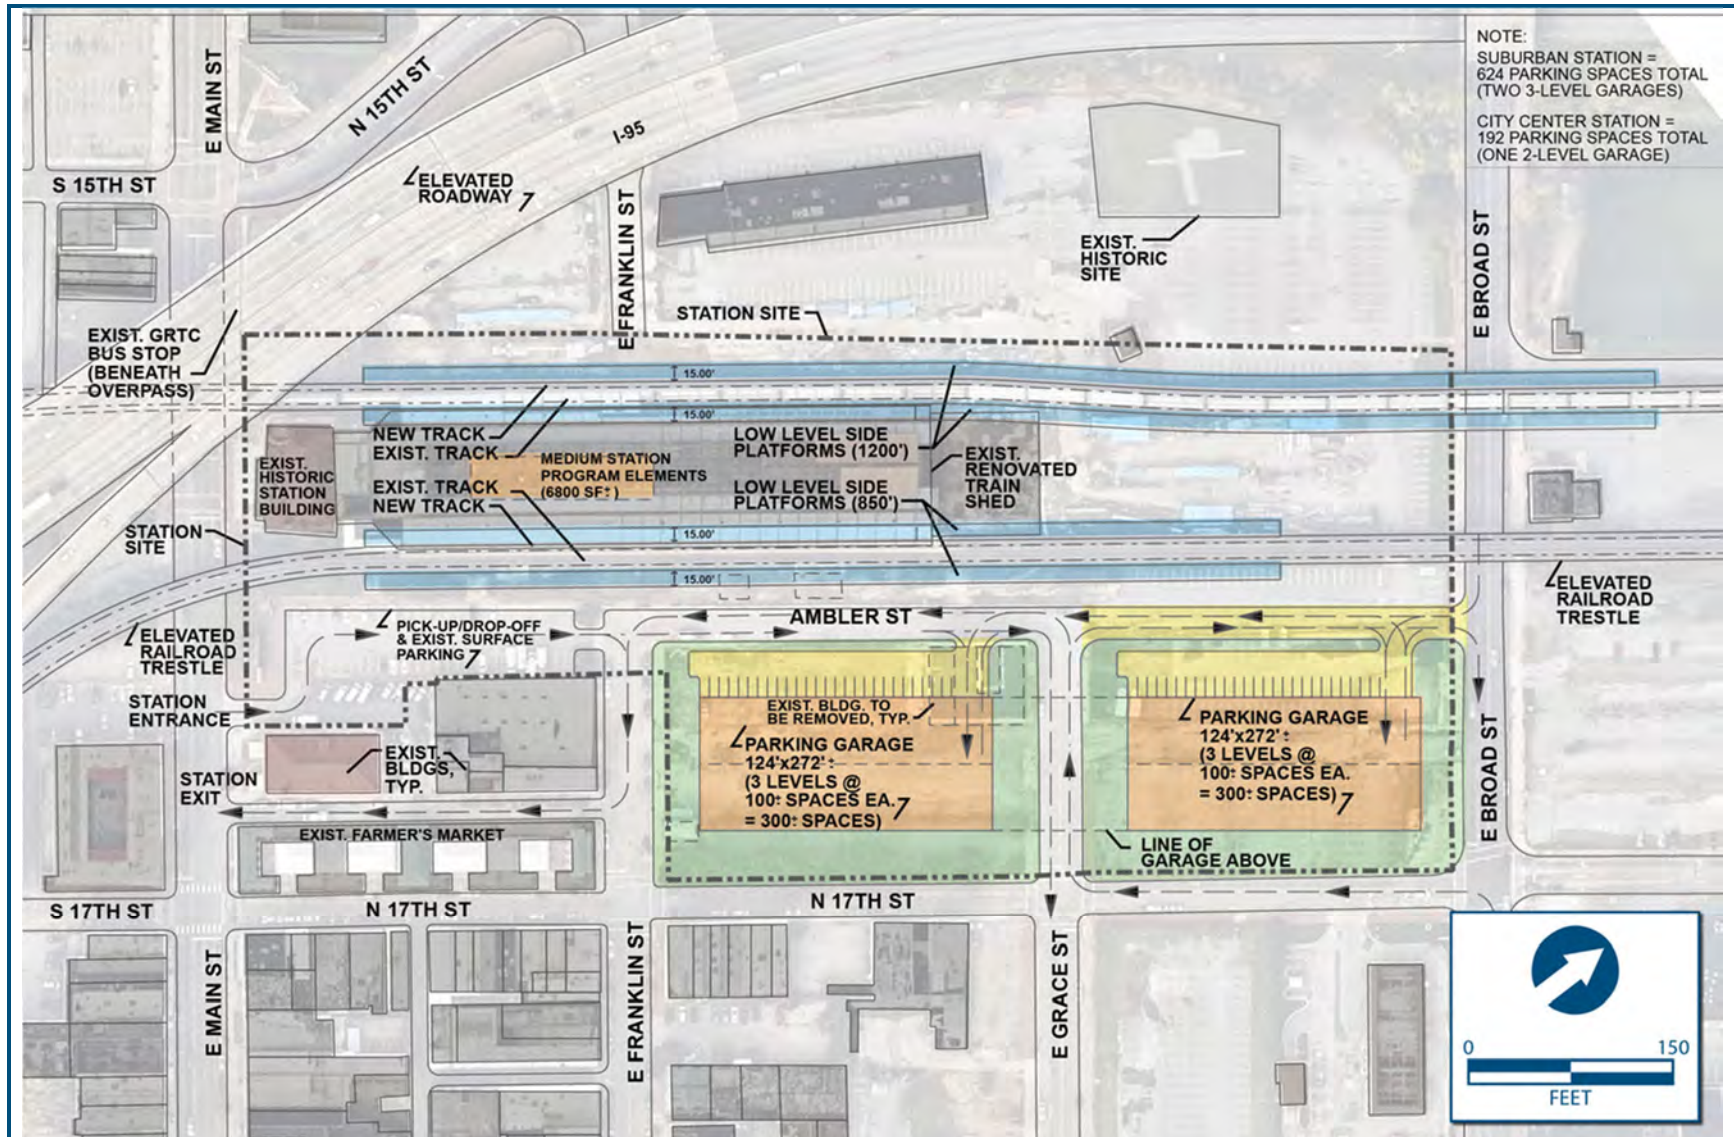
Main Street Station Improvements for Build Alternative 6D
